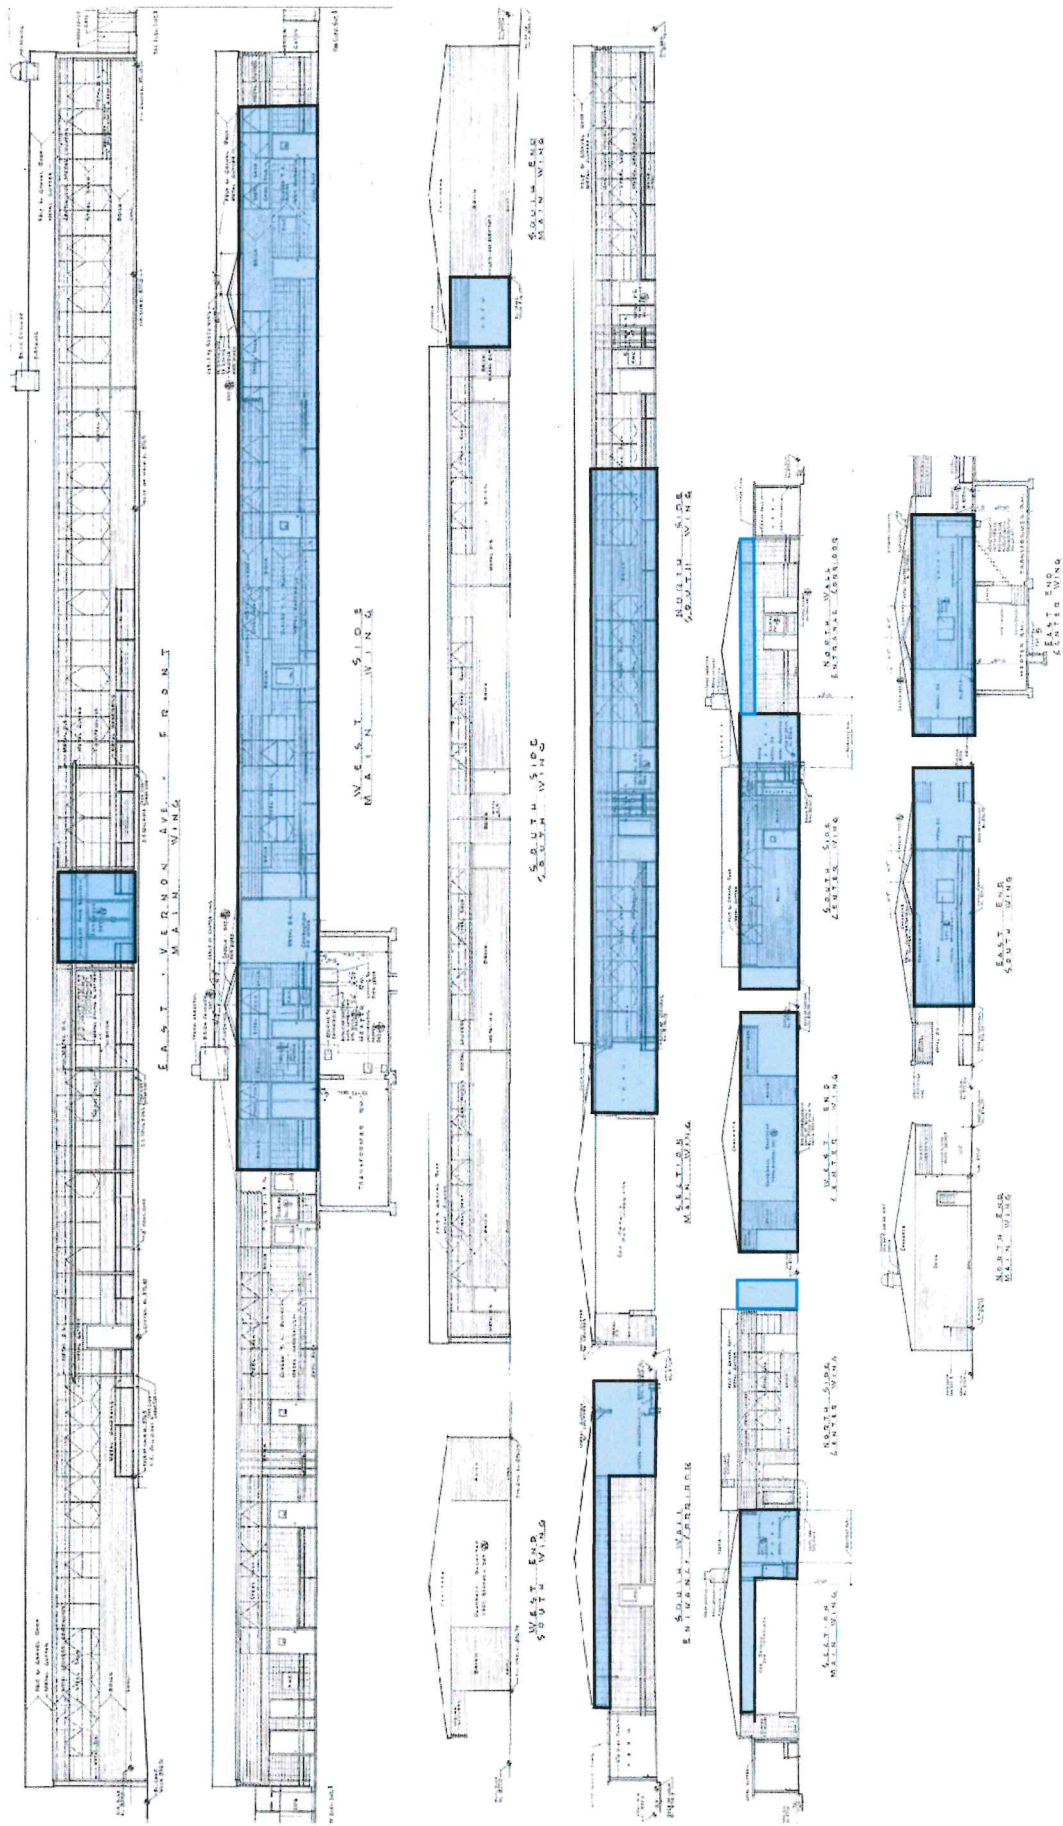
1953 EXTERIOR BUILDING ELEVATIONS ILLUSTRATING THE EXTENT OF ADDITIONS (IN BLUE)
